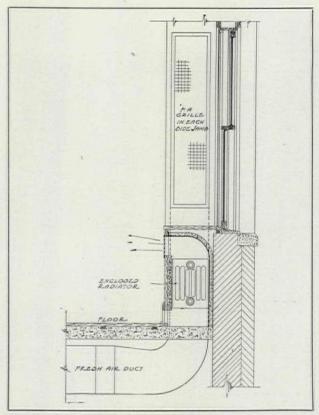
Typical Method of Providing Fresh Air for Dining Rooms, Ball Rooms, Etc.
